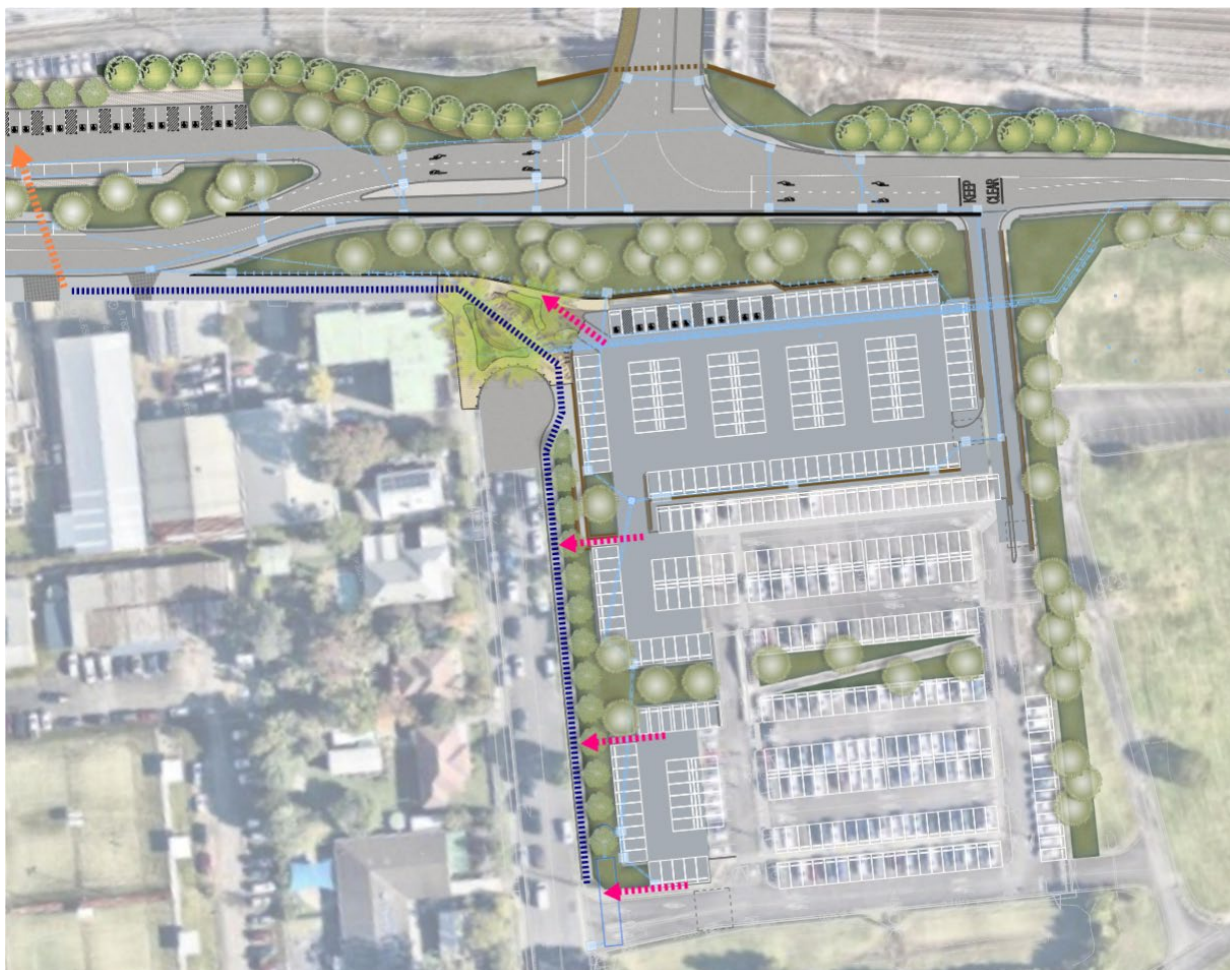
Expanded Rose Street commuter car park and pedestrian facilities
